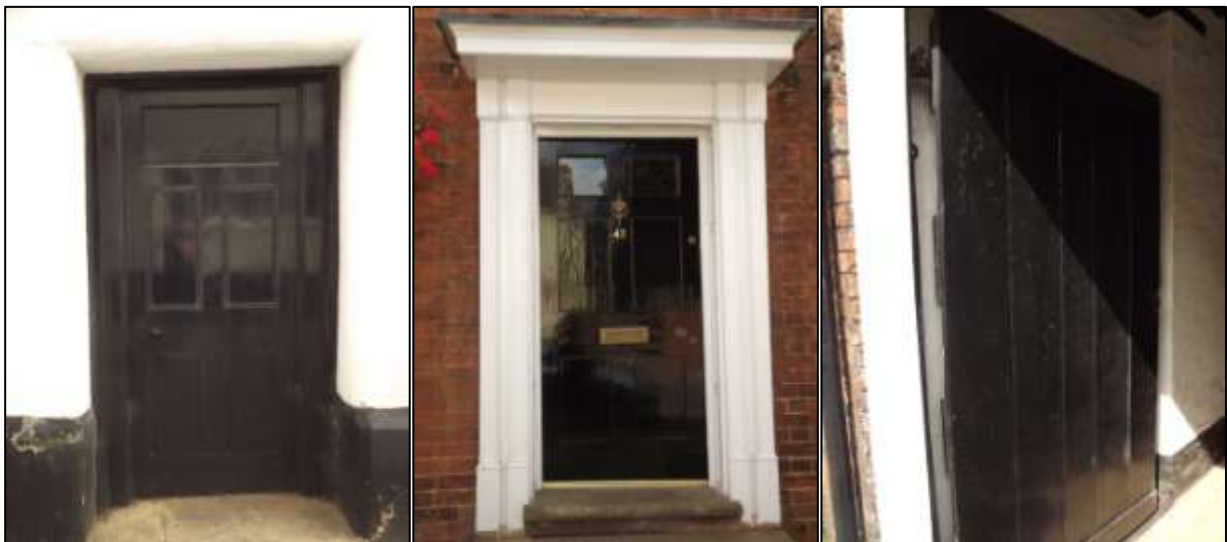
Door examples. Left-right: The Crown Inn, Small Lane: scratch moulding to four panels, fanlight obscured. 47 High Street: scratch moulding with upper panels glazed, with double reeded pilasters. 38 High Street: plank door leading to former burgage plot.
